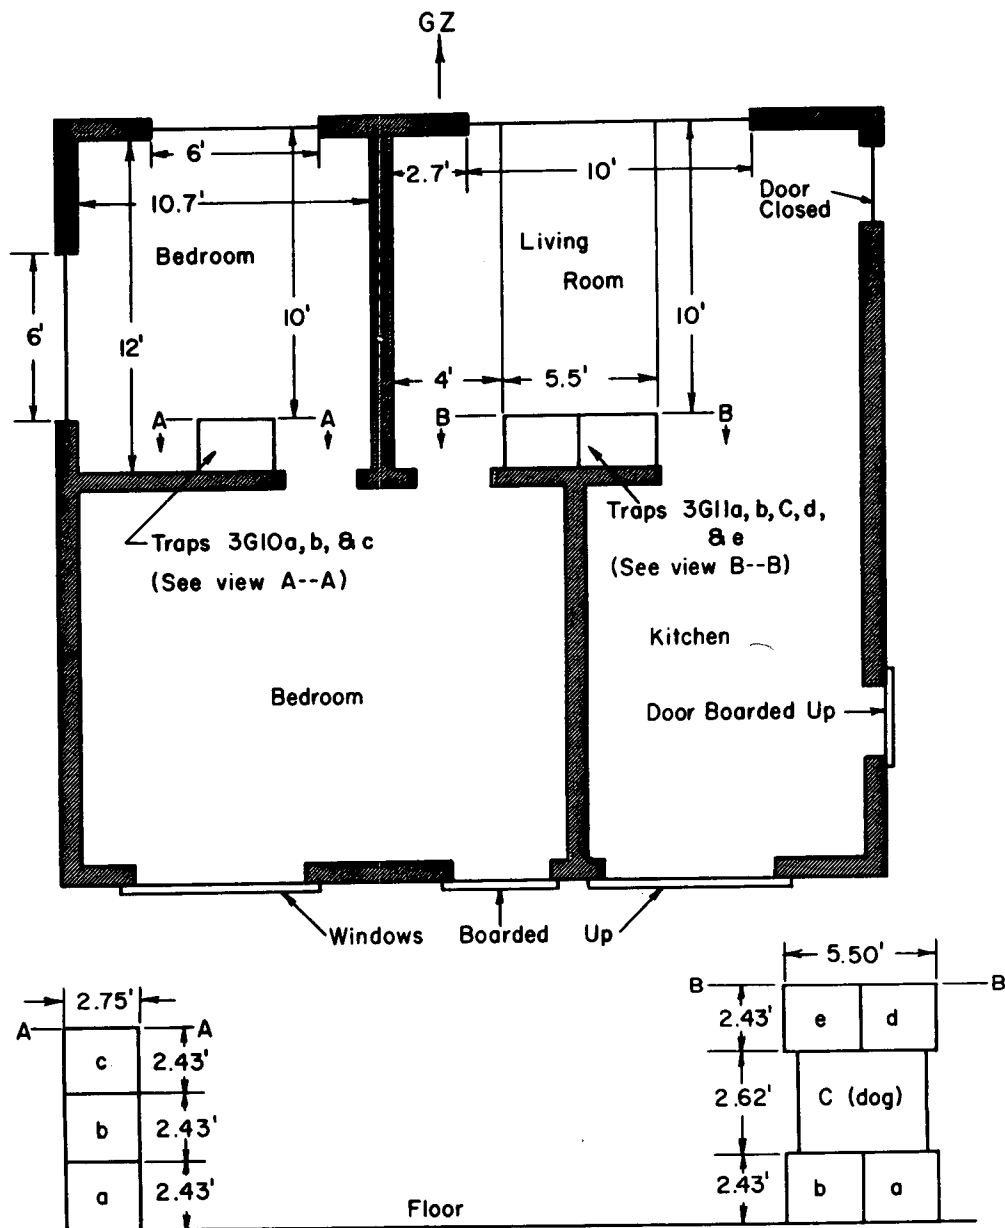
Floor plan of reinforced concrete-block house, 4700-ft range. Traps 3G10a, b and c, and 3G11a, b, d and e all have type I absorbers. The bedroom window opposite traps 3G10a, b and c is 3 ft 7 in. above the floor, has nine 11.5- by 23.5-in. panes, and is 6 by 3 ft. The living-room window opposite traps 3G11a, b, d and e is 2 ft 7 in. above the floor, has twenty 11.5- by 23.5-in. panes, and is 10 by 4 ft.
